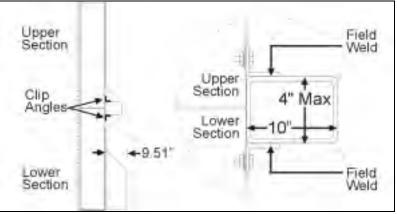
Outdoor Mounting Method Example (Horizontal Tubing)
